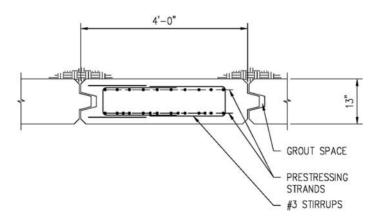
Plan section of a prestressed concrete sheet pile with tongue-and-groove joints—a common pathway for soil migration
